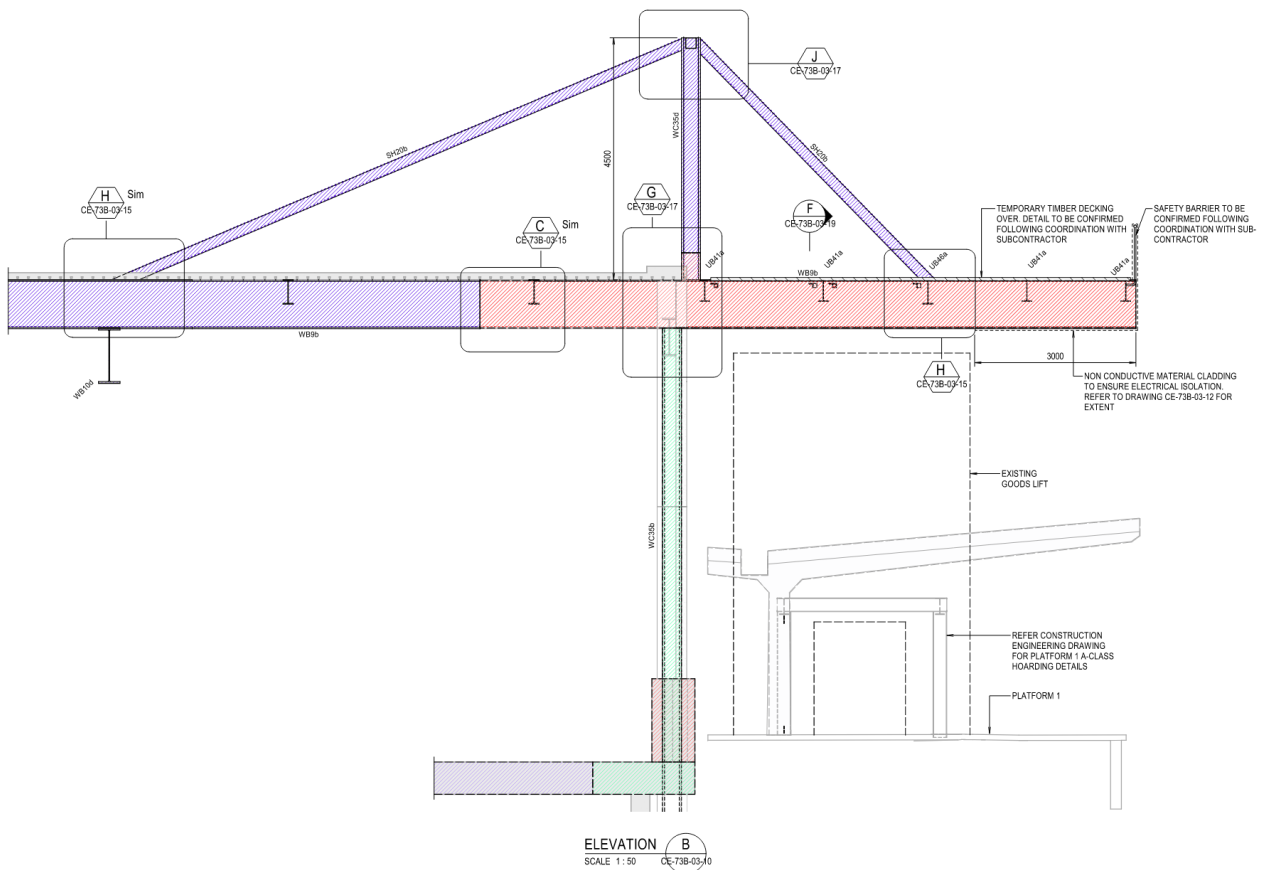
Overhead Protection Sections – Platform 1 Central Station
